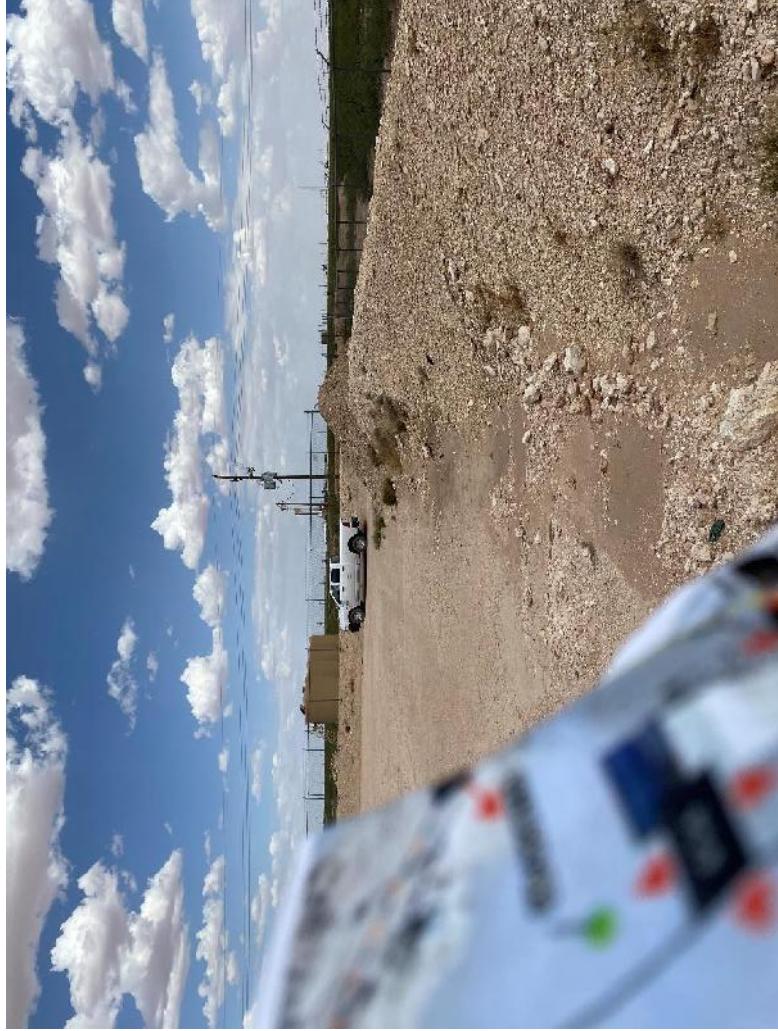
Photograph location 30. August 22, 2024. Northeastern extent of excavation/liner area facing northeast. View of SB-3 location, aboveground pipelines, and northeastern corner of former Tank 970 berm.
